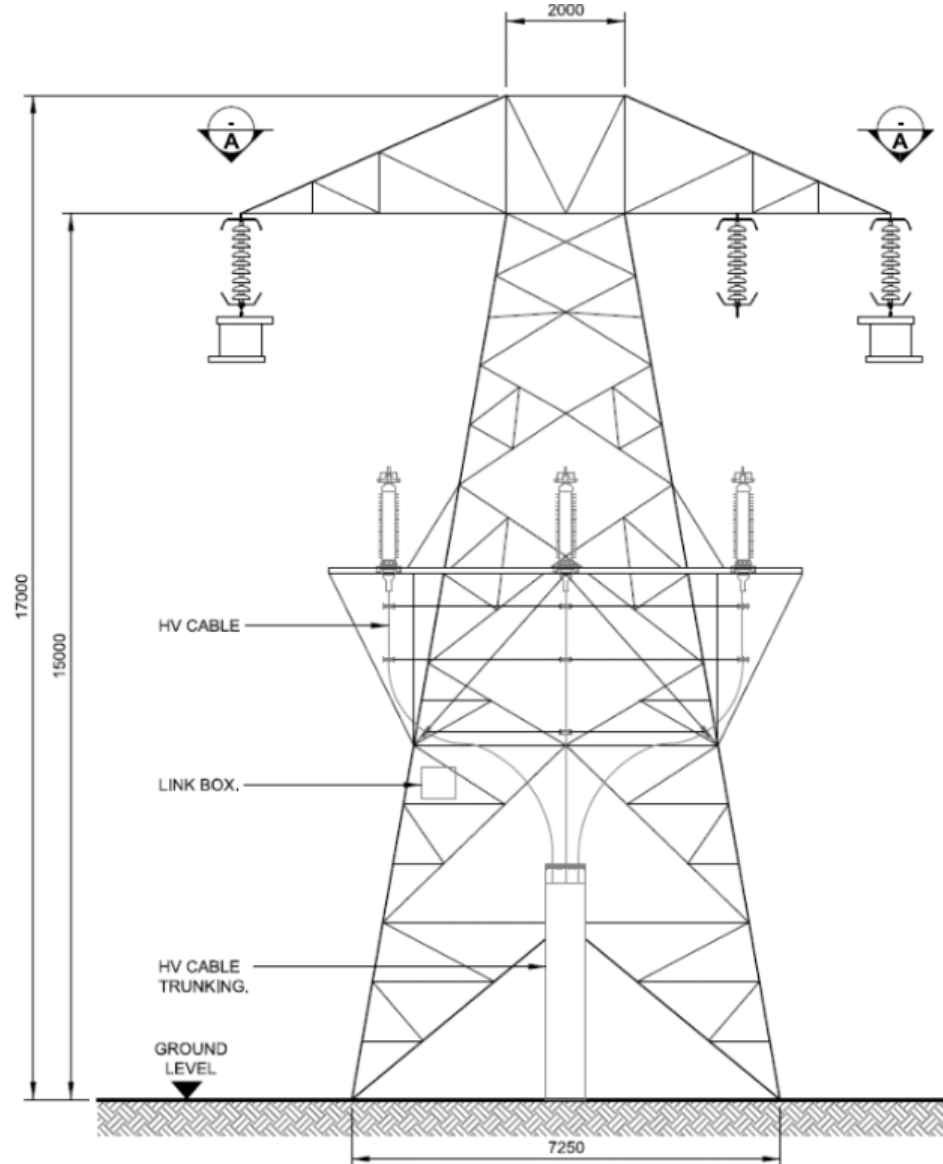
Substation and Undergrounding of 110kV Overhead Line
